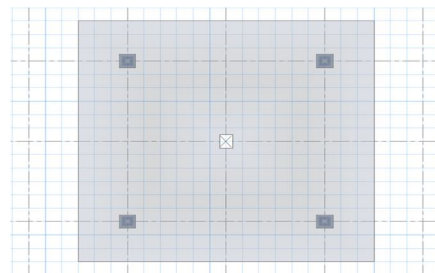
Slab without drop - opening of (400mmx 500mm)
